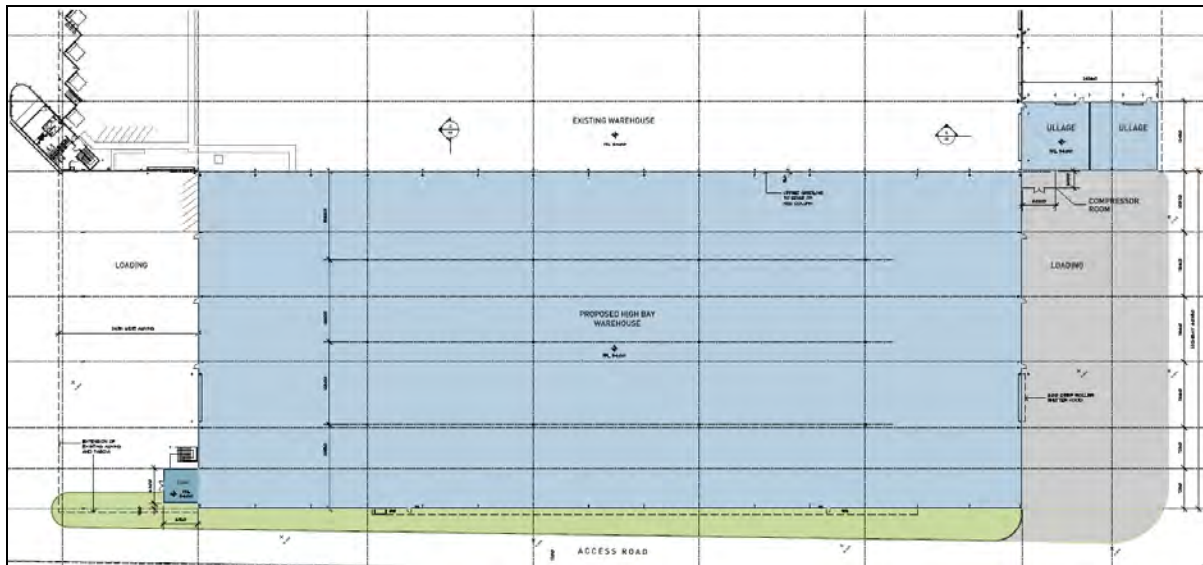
Proposed Warehouse Floor Plan – Stage 5A (Source: Giles Tribe Architects, 2012)
